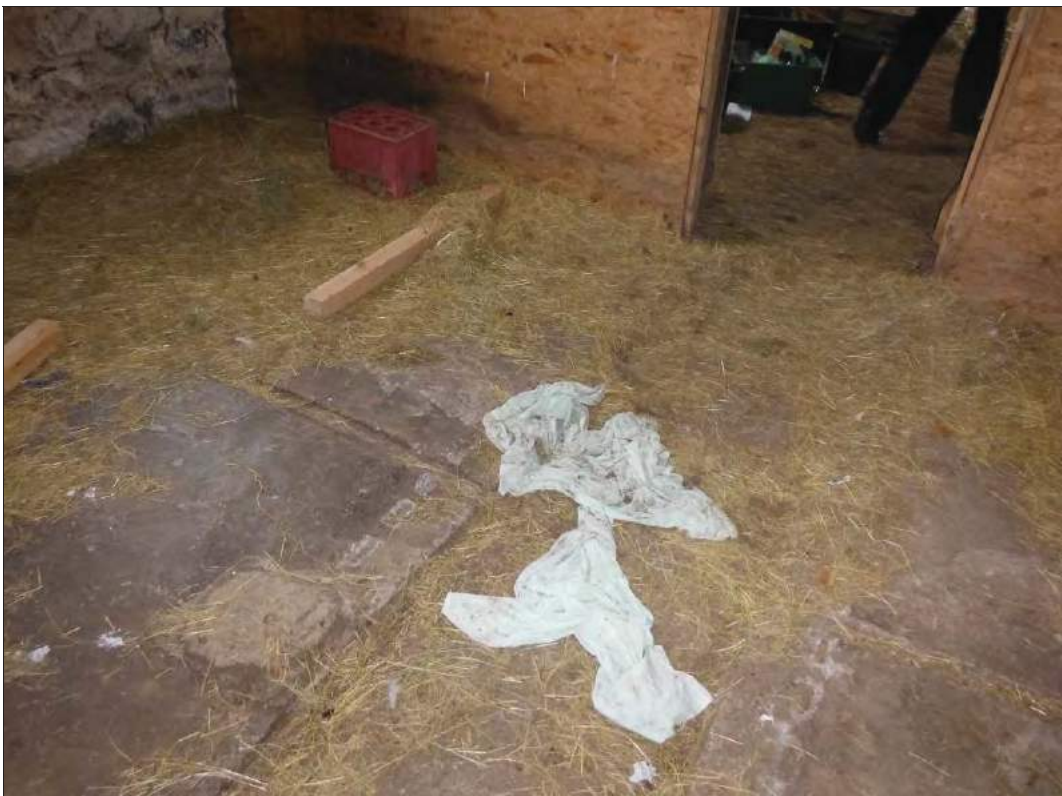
Replacement concrete floor at the central part of the cowhouse showing stalls to either side of a central passage.
